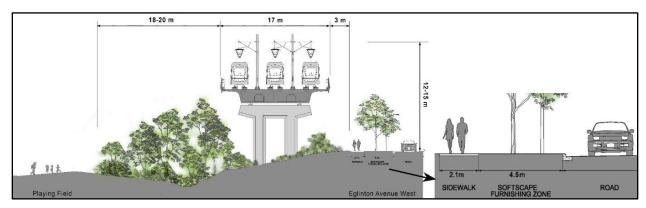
Elevated Guideway Double-Pier Configuration (West of Jane Street)
